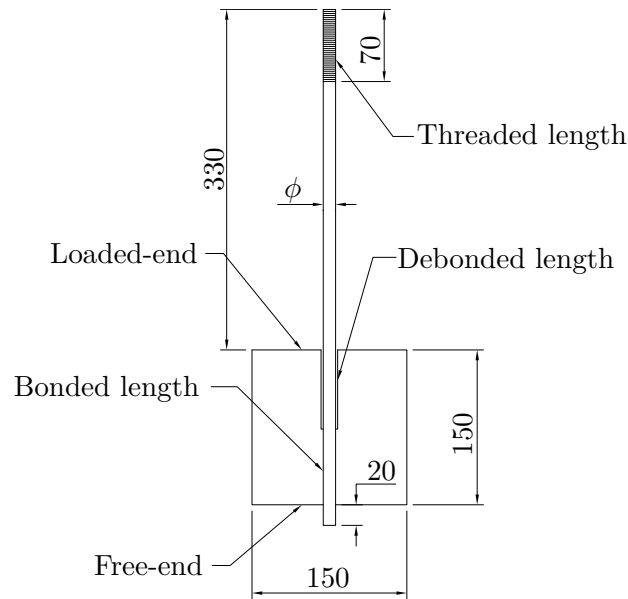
Pull-out specimen dimensions and specifications for embedded rebar.
